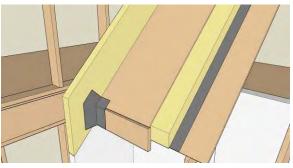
Roof construction with exterior insulation and drainage plane 2 – flashing membrane applied at junction of fascia, roof nail base and insulating sheathing
